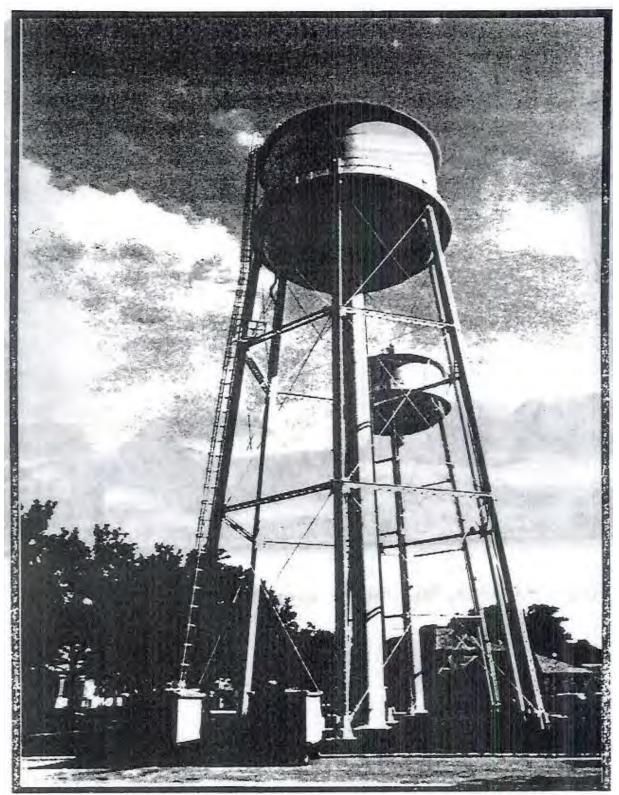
View of Water Tower 8020 looking southwest, undated. Credit: Scott Air Force Base archives.
